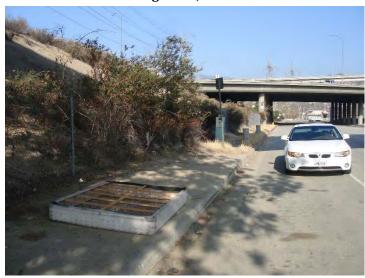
San Fernando Road Highway Near I-5 Overpass: August 11, 2015
